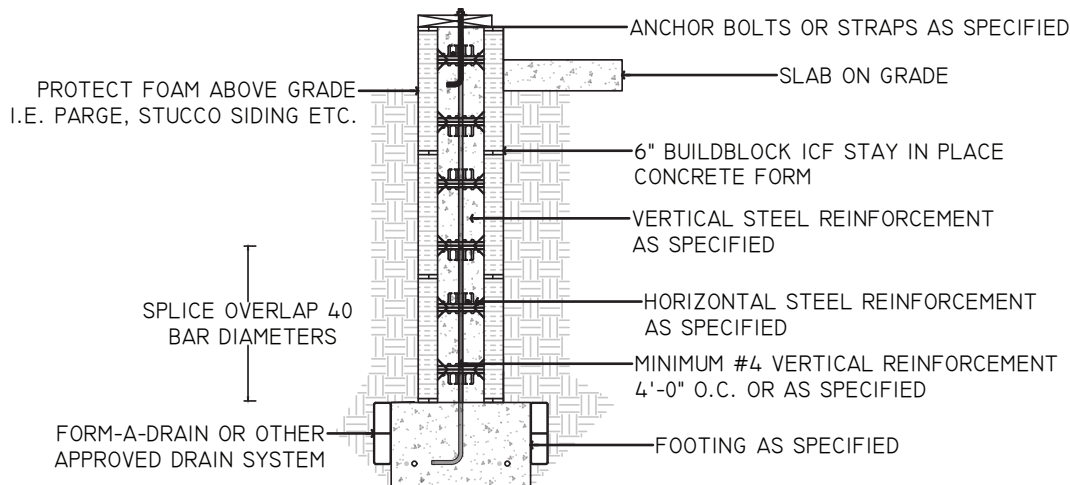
TYPICAL BUILDBLOCK CRAWLSPACE WALL SECTION CUT THROUGH FLAT WALL OR VERTICAL CORE OF SCREEN GRID WALL.
